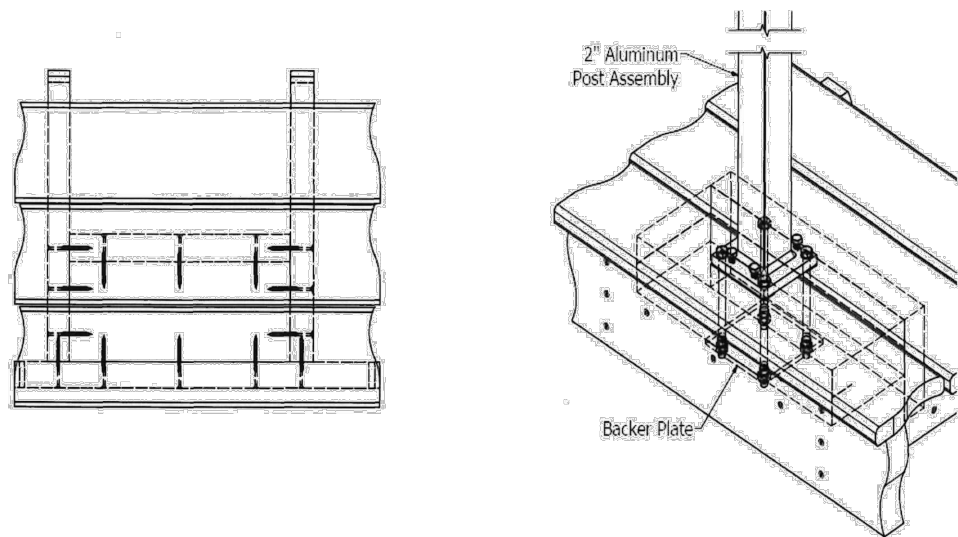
STRUCTURAL WOOD FRAMING 2" POST MOUNT
